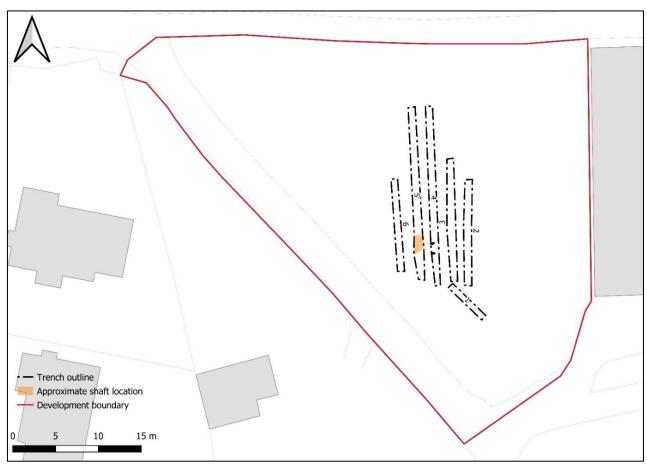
SITE PLAN DRAWING SHOWING EXCAVATION WORKS.
